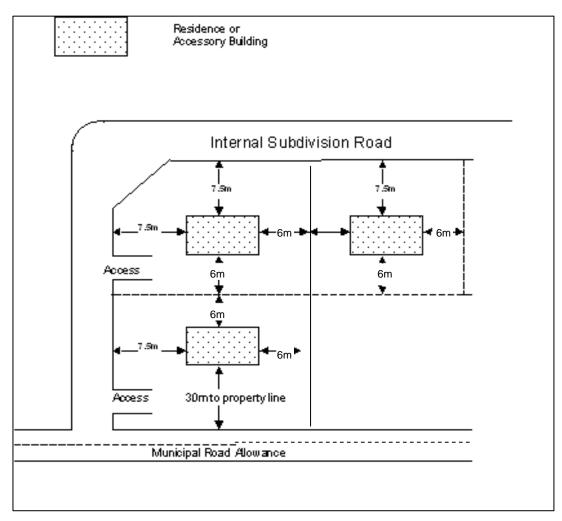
RESIDENTIAL AND ACCESSORY BUILDING SETBACKS FROM INTERNAL SUBDIVISION ROADS AND GOVERNMENT ROAD ALLOWANCES
